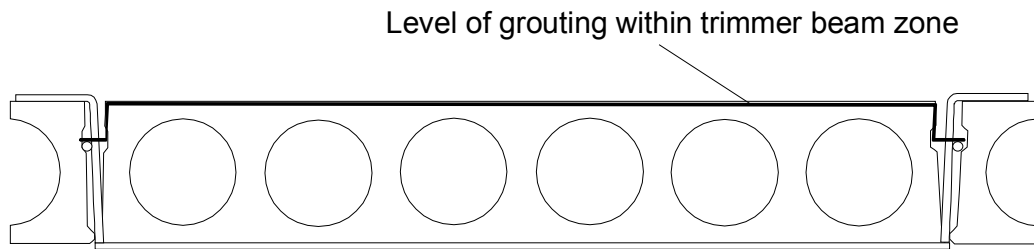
Cross-section of slab placed on trimmer beam. Note that, to facilitate undisturbed measuring of strains, the grouting level at the ends of the trimmer beam was lower than elsewhere.
